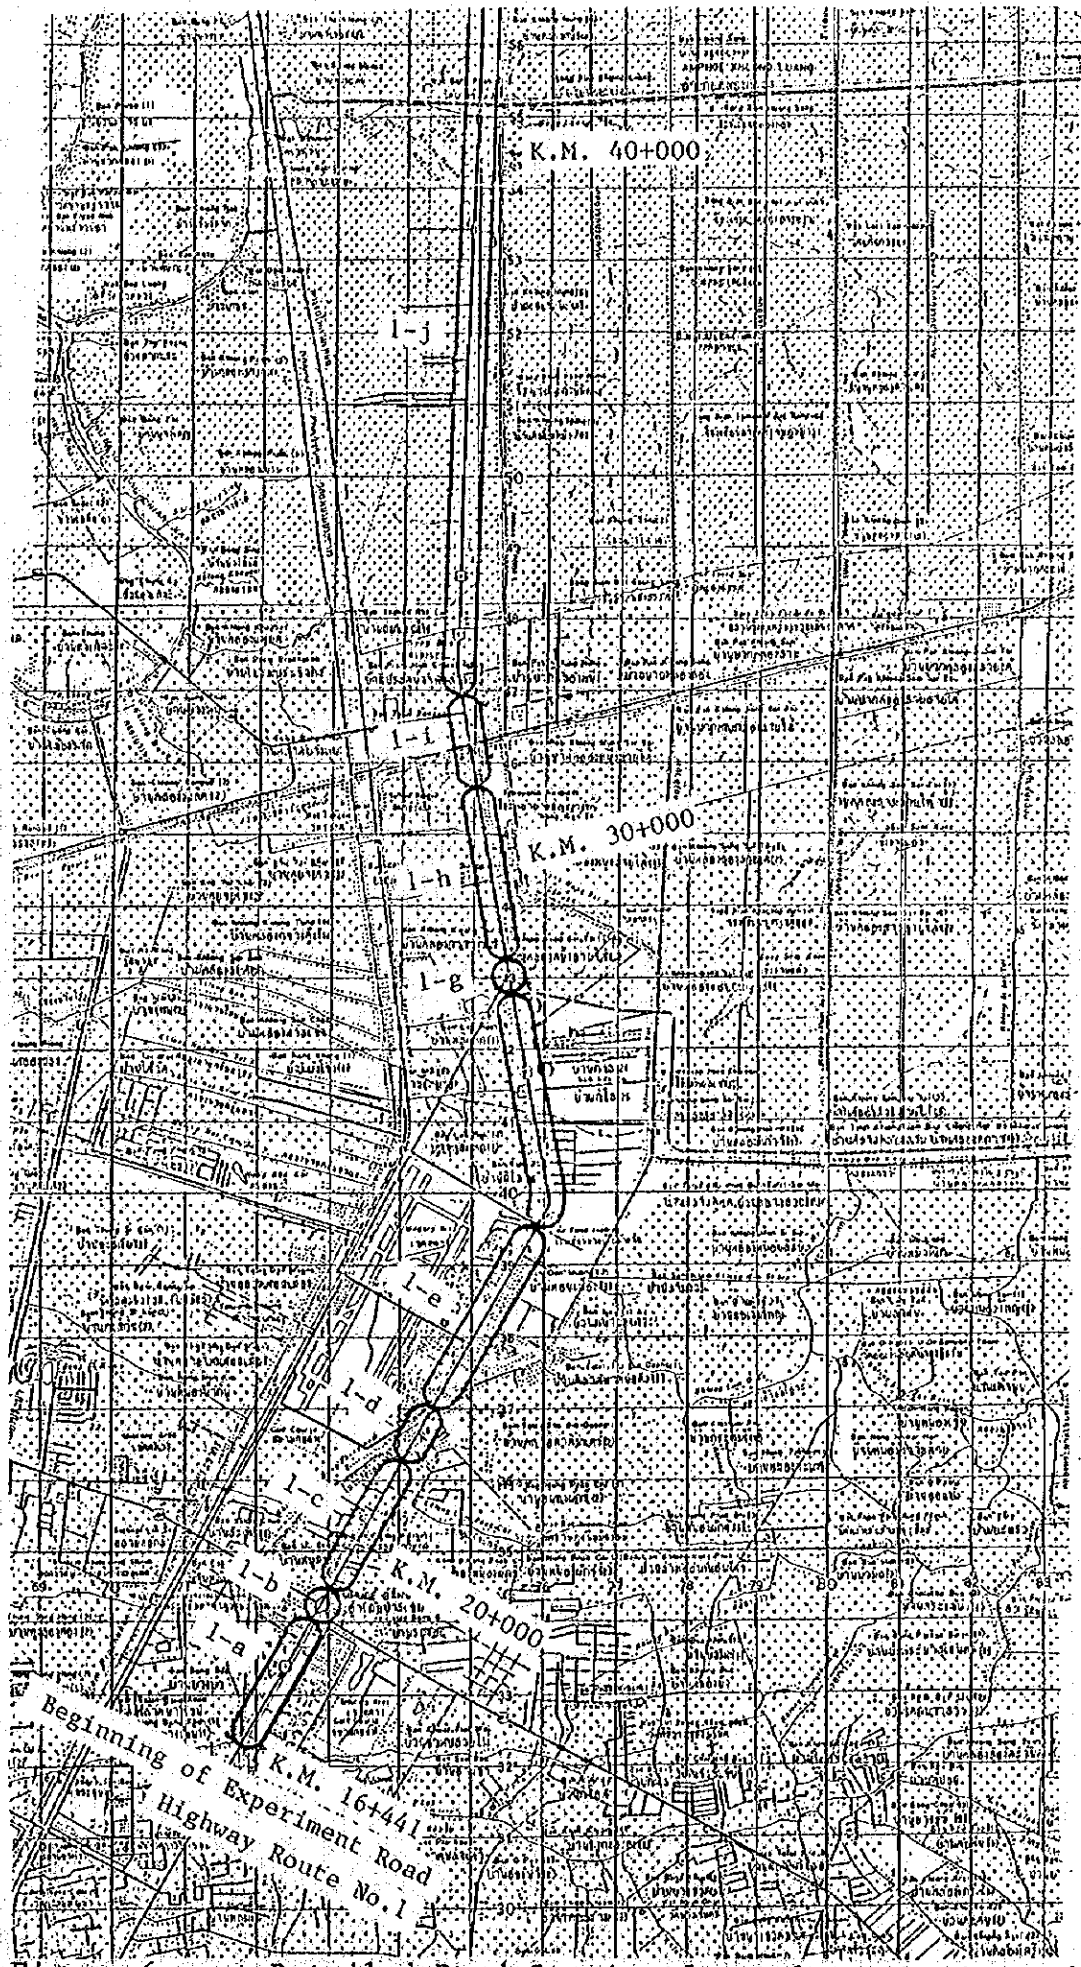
Detailed Road Section for Safety Plan (Route 1)
